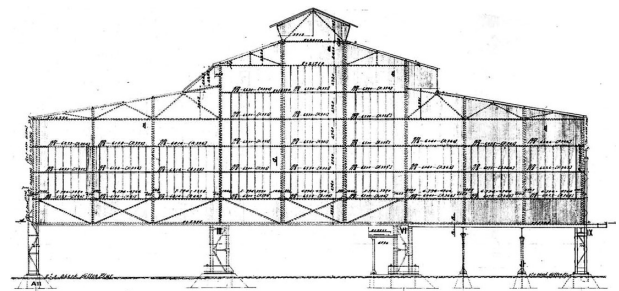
Drawing of No. 2 Steel Making Plant⁵⁾
